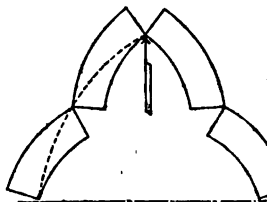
Failure of Pointed Arch. Opening of Arch-ring
